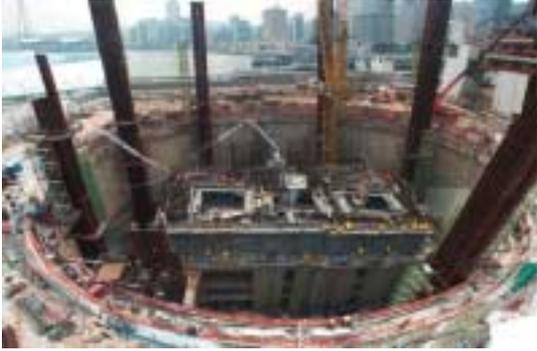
Close-up view of the formwork system used for the construction of the core wall at the early stage. Another climb form set would be used to replace this when the core wall reached ground level
